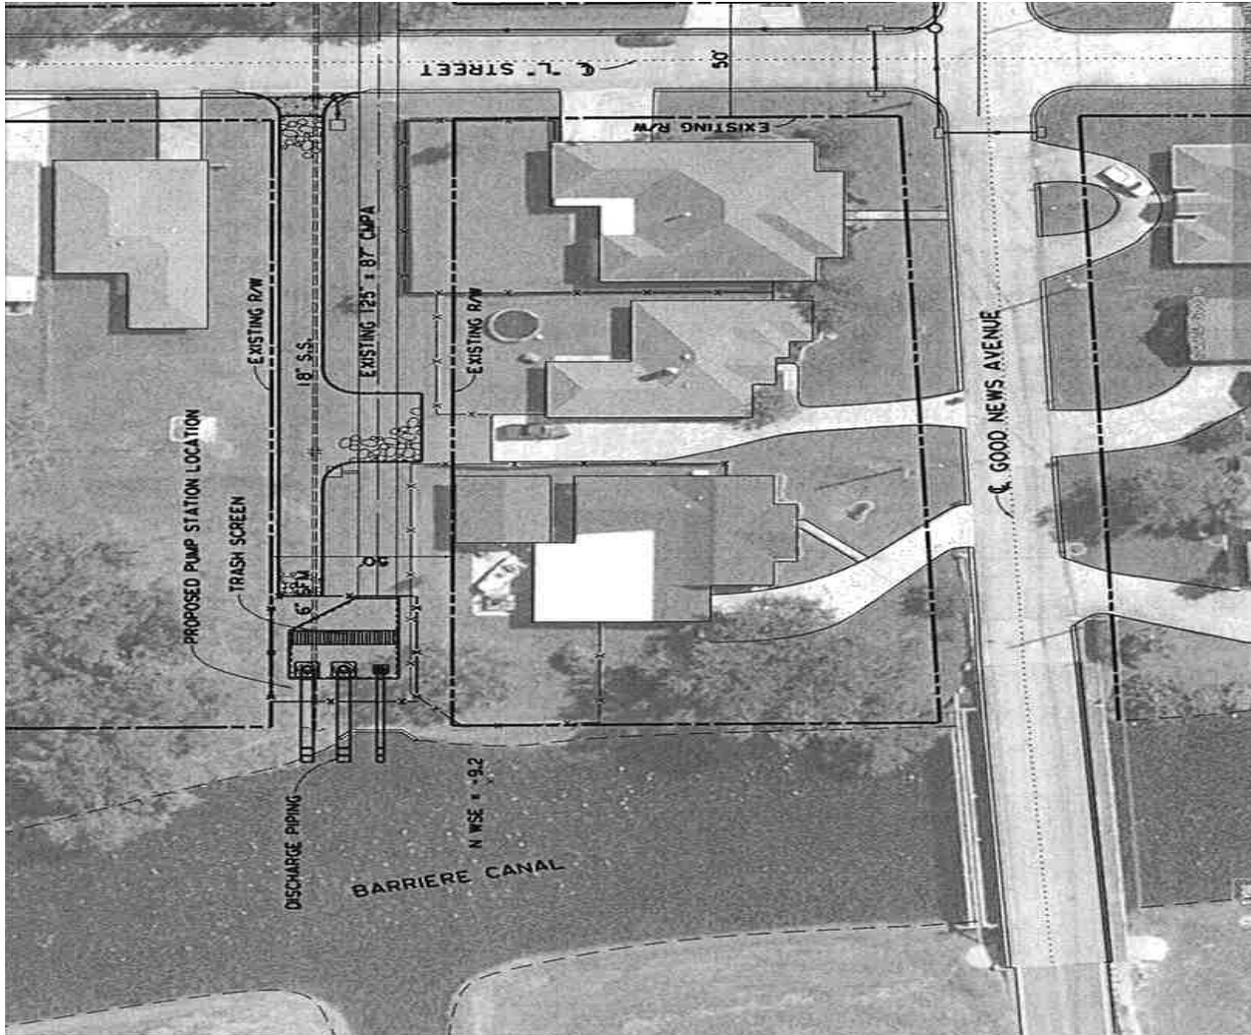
Good News Drainage Pump Station, Belle Chasse, LA Plan View Overlaid on Aerial Location Map
